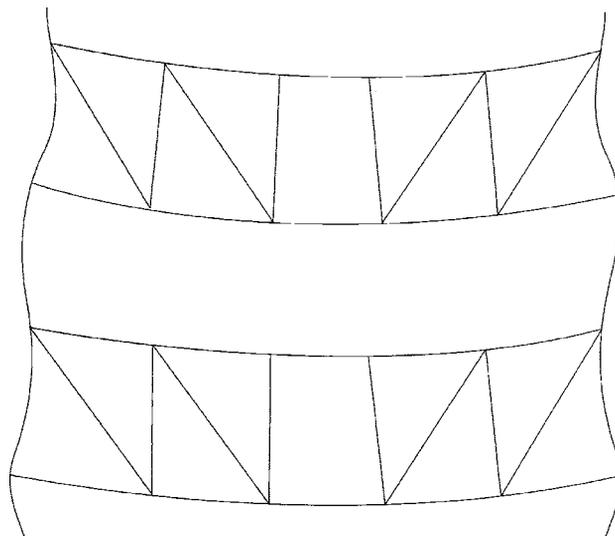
Deformations of staggered trusses induce bending in exterior columns.
